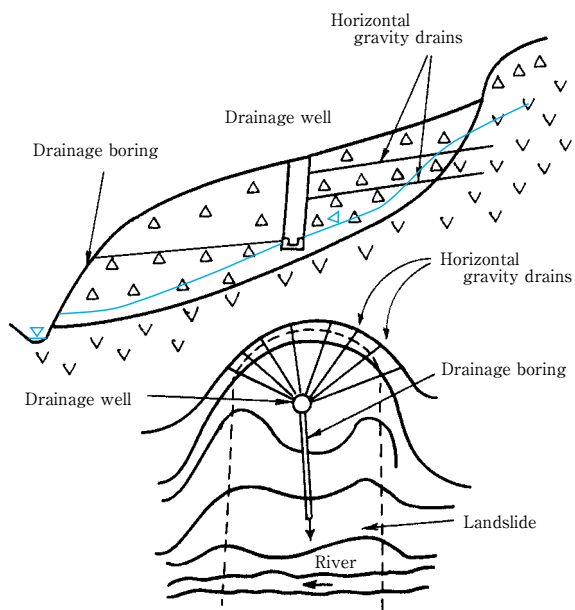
Drainage well, horizontal gravity drains, drainage boring
